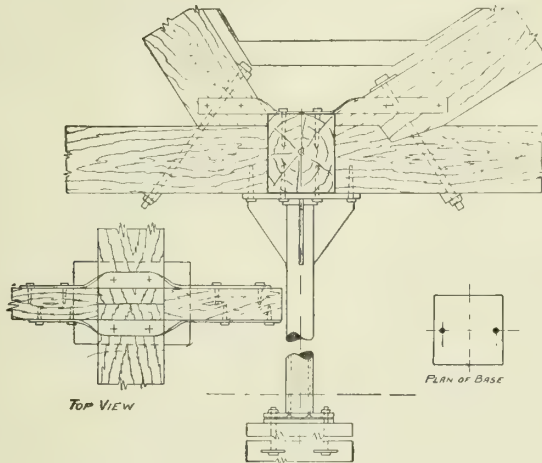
DETAILS SHOWING CREX COLUMNS IN STORE FRONT CONSTRUCTION
